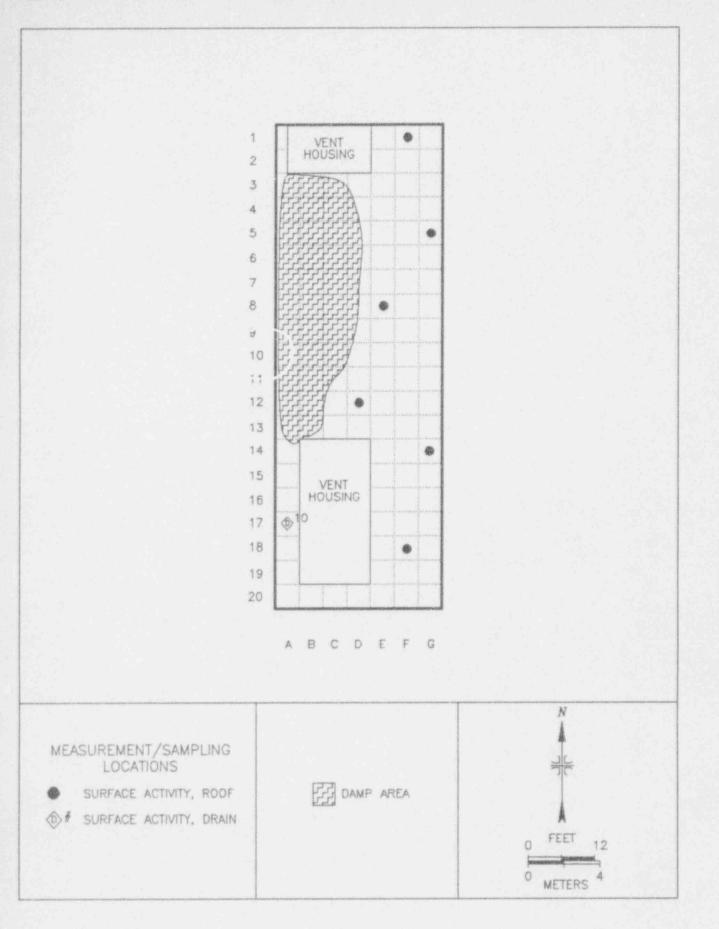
Building 65, Lower Roof - Measurement and Sampling Locations
